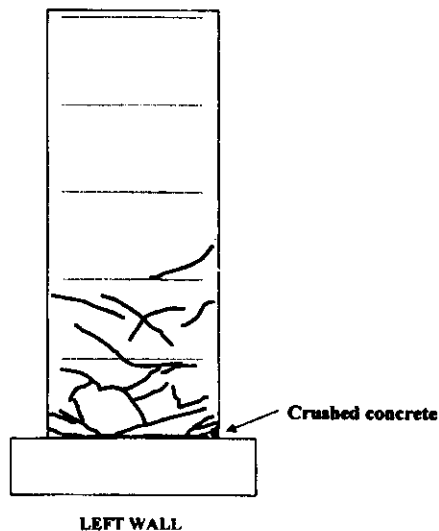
Damage pattern of one wall at the end of the Melendy Ranch (1.35g) test
